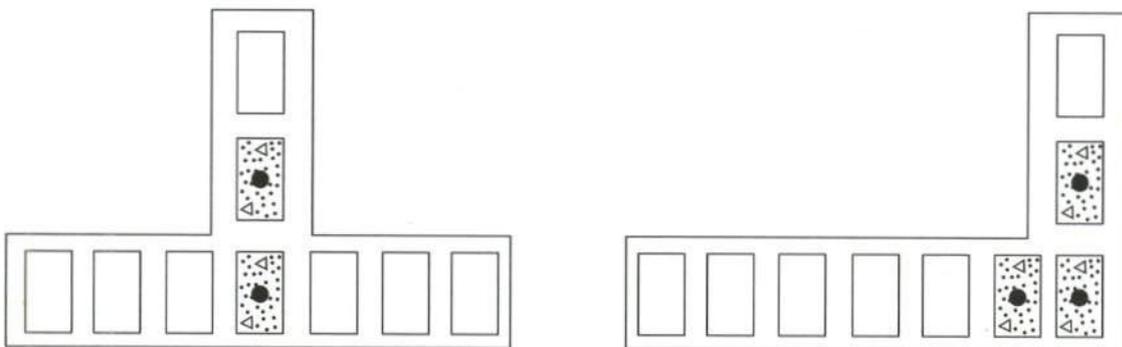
Vertical Reinforcement in Cavities for Hollow Block Masonry
